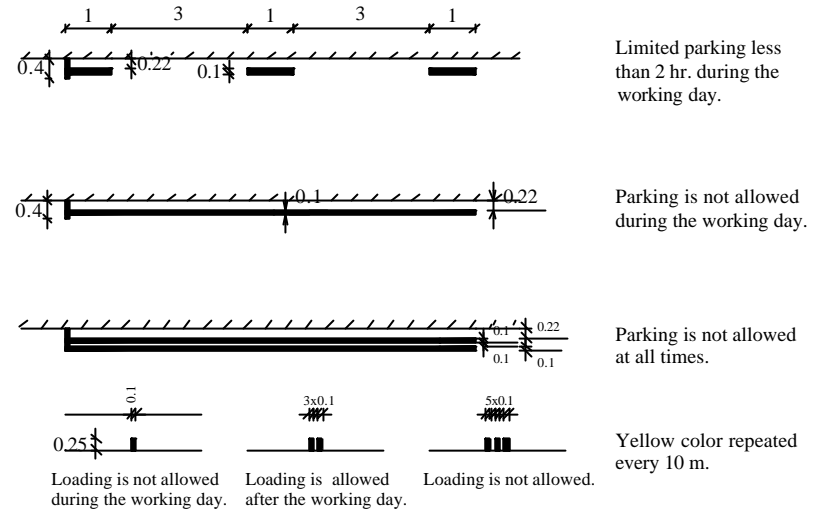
shows a typical example of the pavement marking, edge marking and intersection marking. It is mentioned on the figure the case when each type of this pavement marking has to be used. As mentioned before, presently there is a standard in Lebanon and it is recommended to follow this standard in the all new implemented projects.
